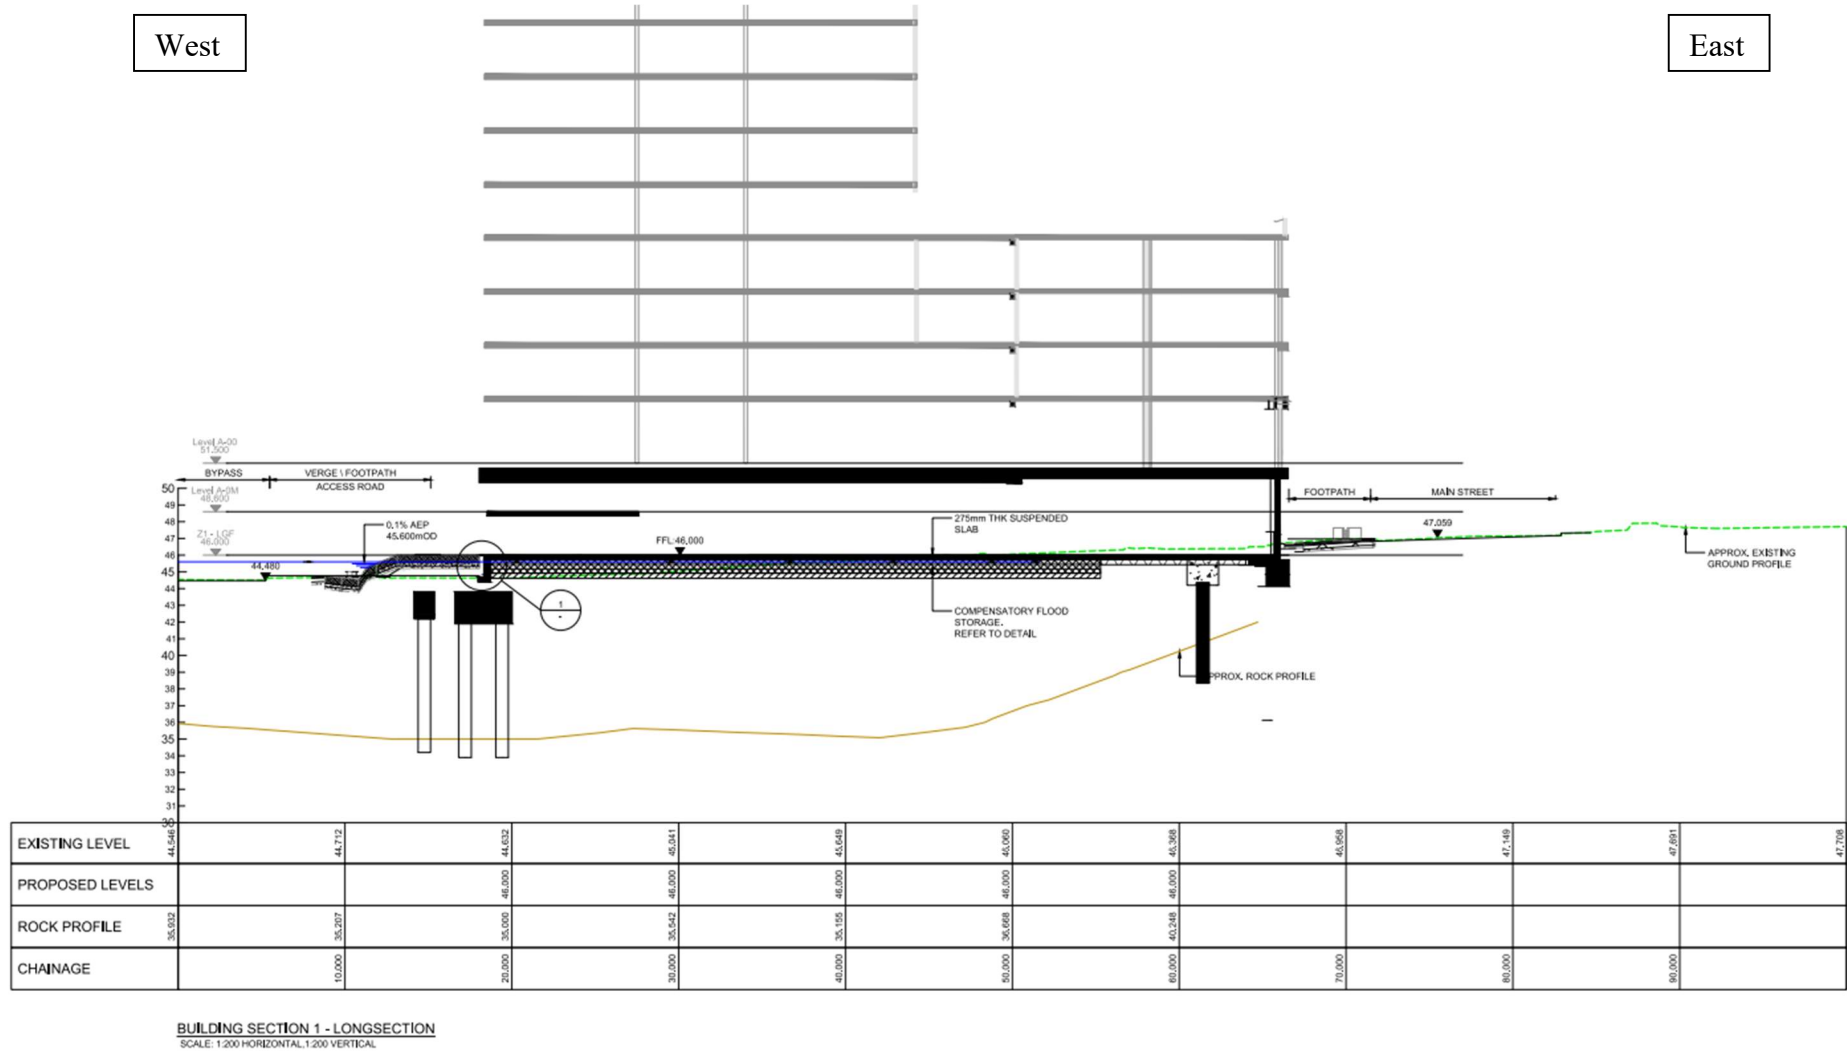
Cross Section A-A of the proposed development showing the lower ground floor and foundations (TJOC dwg 16031-TJOC-XX-XX-DR0S-0010)
